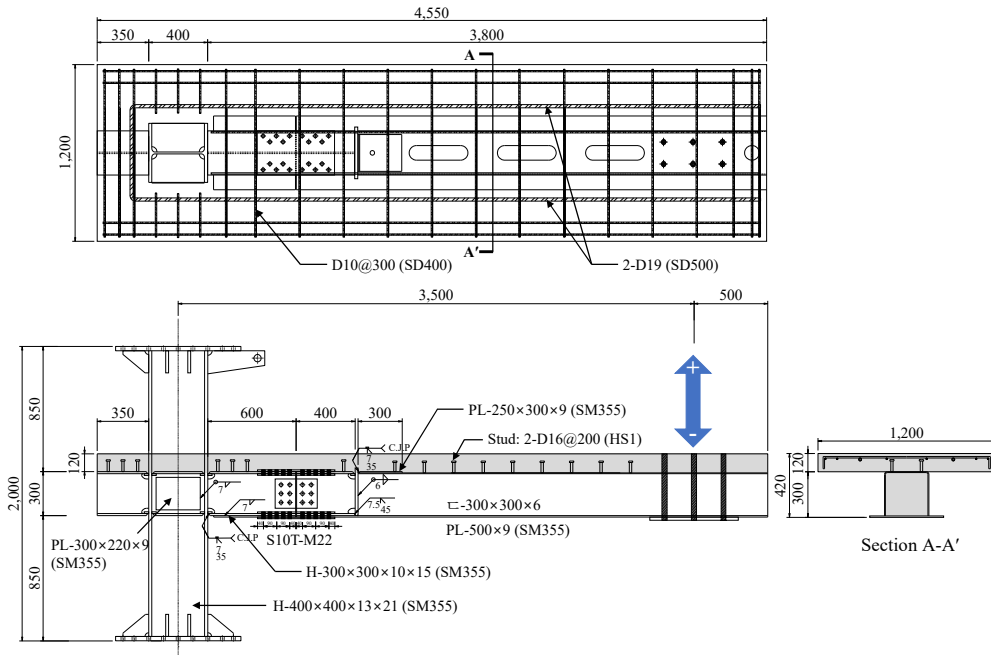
Specimen details of column-beam joint tests (Unit: mm)
